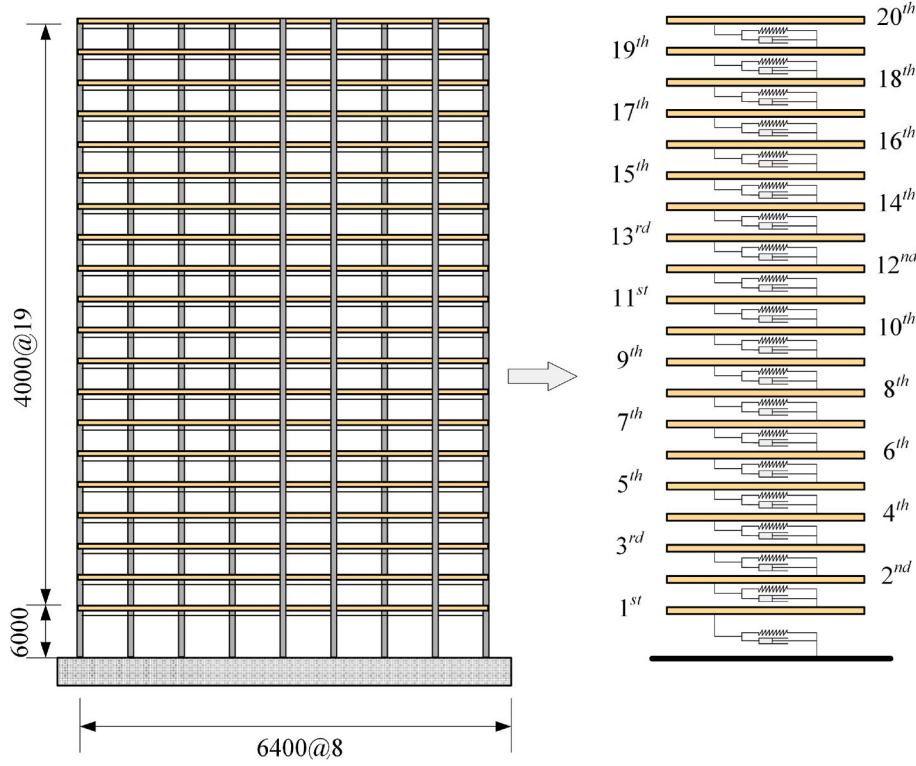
Benchmark structure: A 20-story steel building provided by JSSI.
